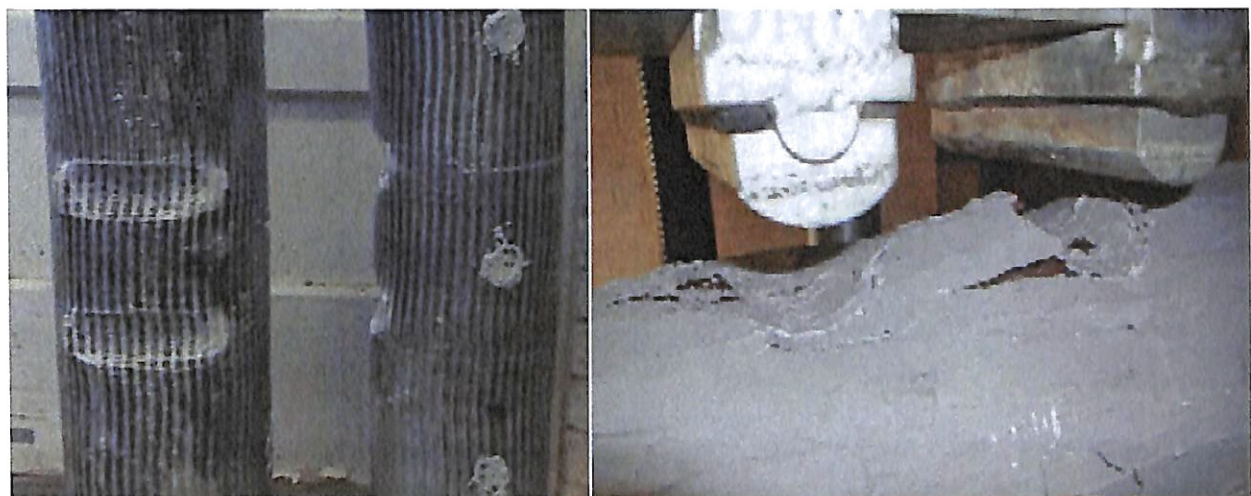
Localized Crushing at Loading Points on Flexural Specimens
